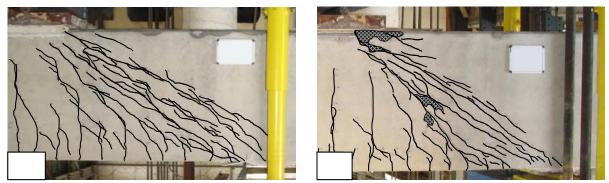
Deep beam specimens: a) I-03-2 and b) III-1.85-03b at failure
